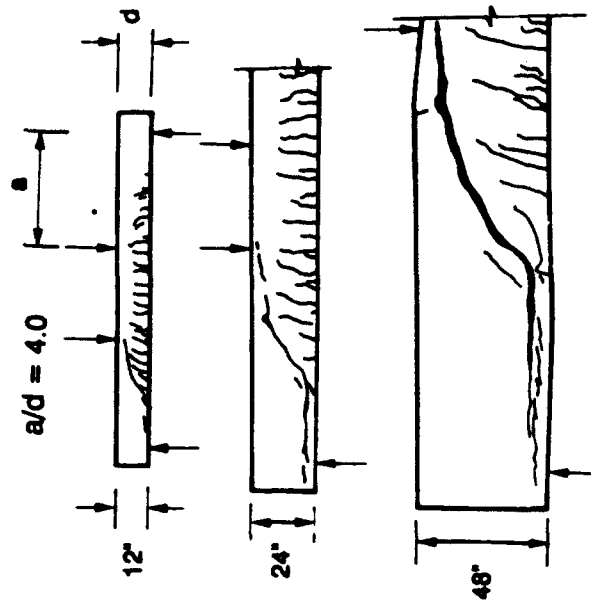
Example of Geometrically Similar Reinforced Concrete Structures with Stable Macroscopic Fracture Growth before Failure [adapted from Kari (1987)]
